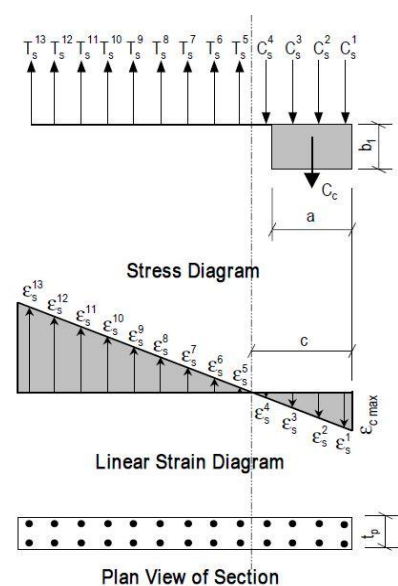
Stress and strain for a concrete wall (ETABS MANUAL)
